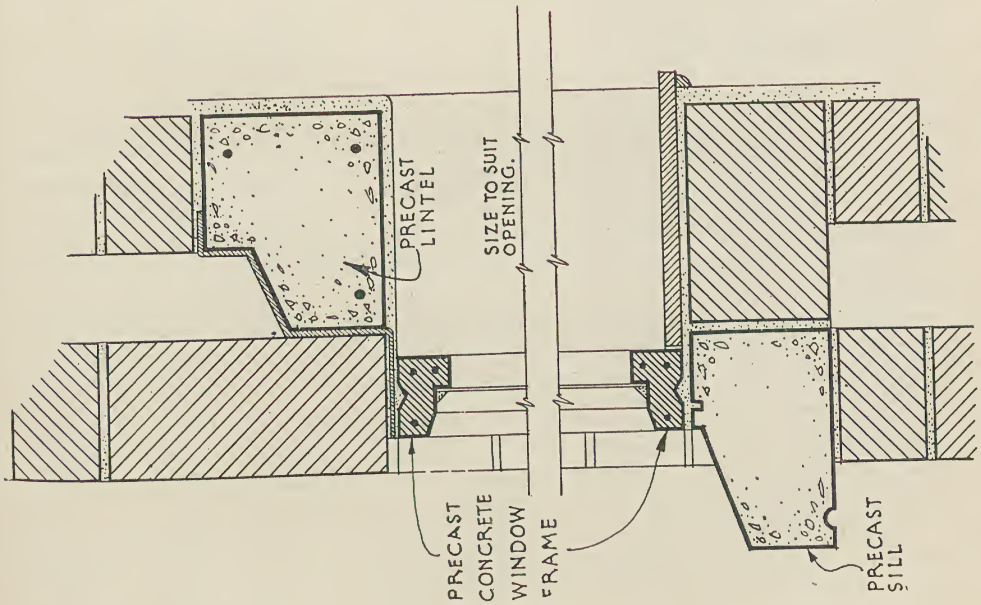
DETAILS OF HEAD AND SILL IN WALL OF CONCRETE BRICKS.
